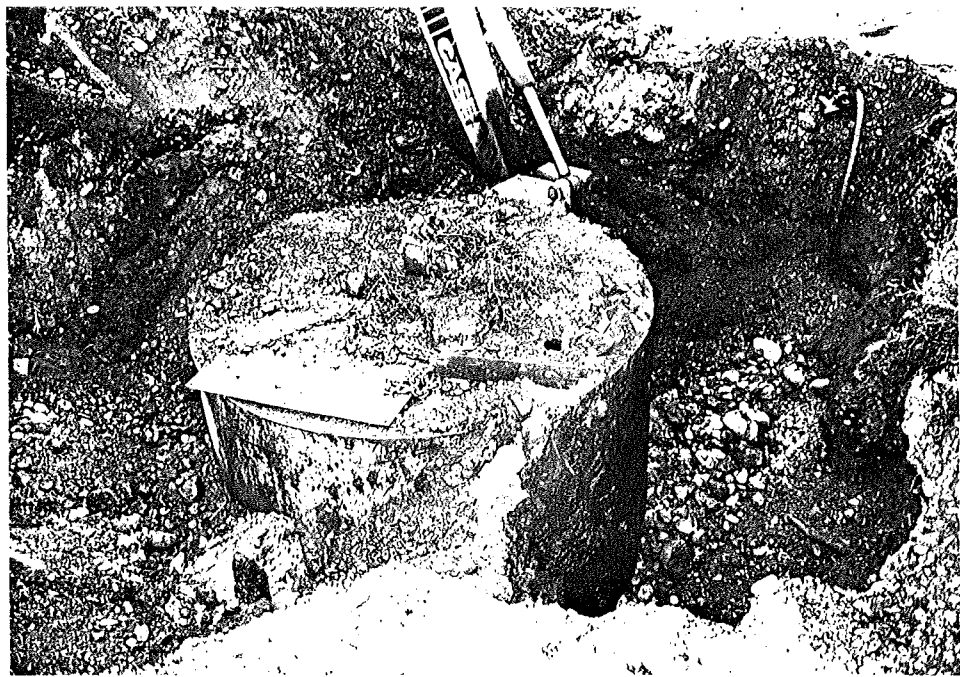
Don Castleman of Lake Oswego, Oregon excavating the UST. Looking south-southwest.
